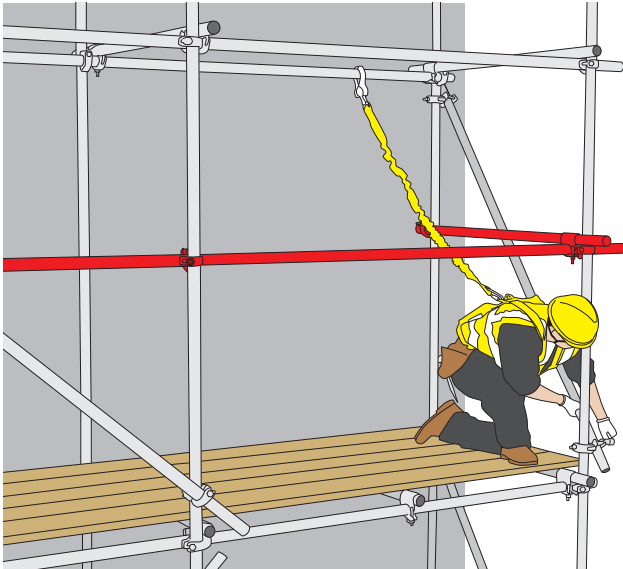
A scaffolder reaching below the single guardrail must be clipped on.
